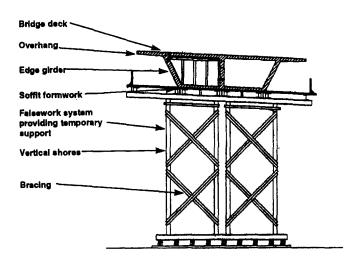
Cross Section of Cast-in-Place Post-Tensioned Concrete Box Girder with Associated Framework and Falsework
